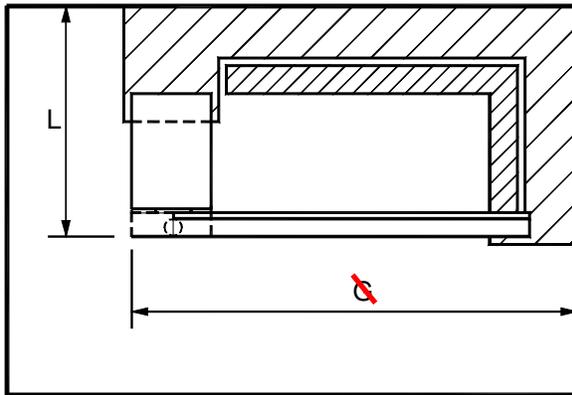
Plan cross-section of multi-face fireplace using high-dome dampers.
